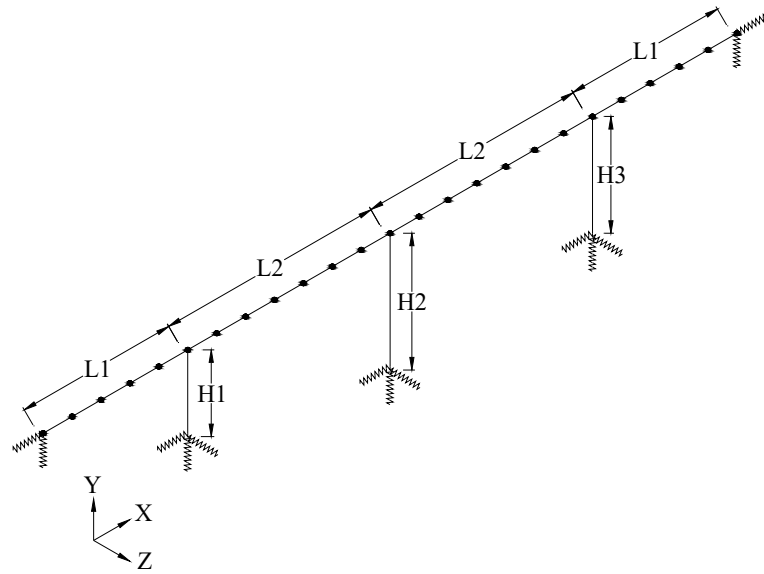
Elevation view and column details of Amador Creek Bridge
